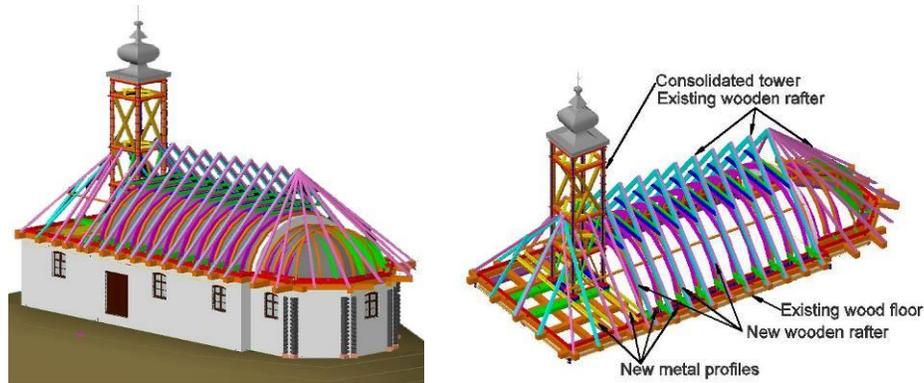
Consolidation solutions of the arches, rafters and wooden beams of the church
